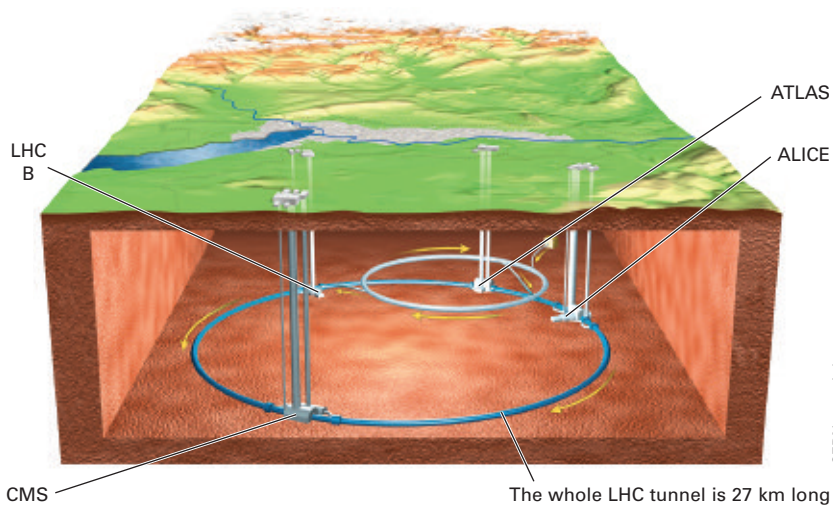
General plan of the LHC site. The four detectors are in large caverns around the LHC tunnel
